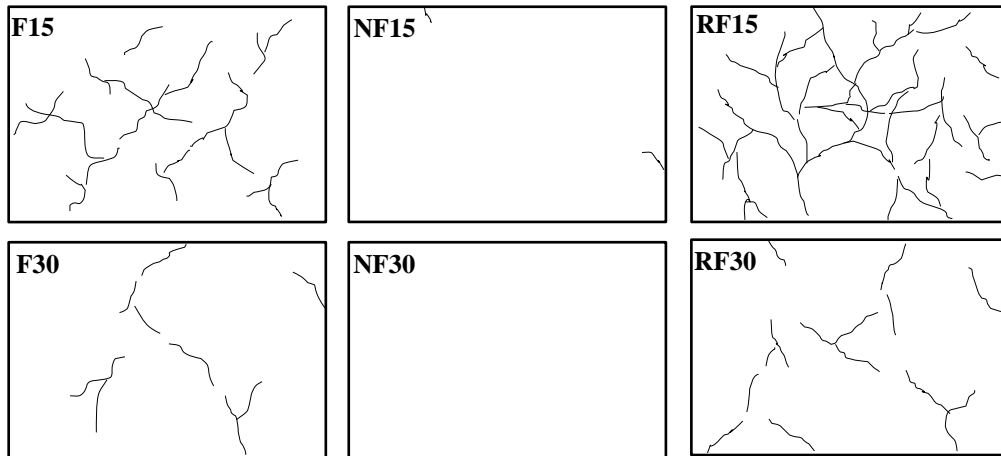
Crack patterns of the repair layer in the concrete slabs at 180 days.
